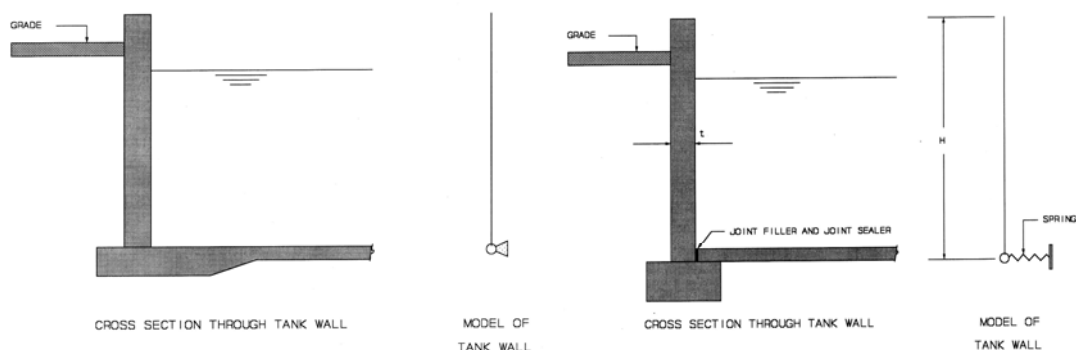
Cross section of wall integral with floor Fig. 2 Wall with independent floor slab
